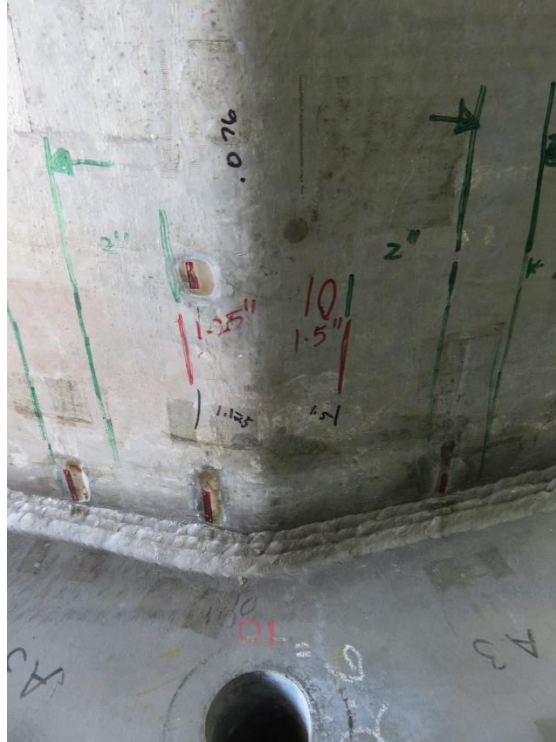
State of Cracks: Specimen 33-3-12-TX-A3 – Bend 10
